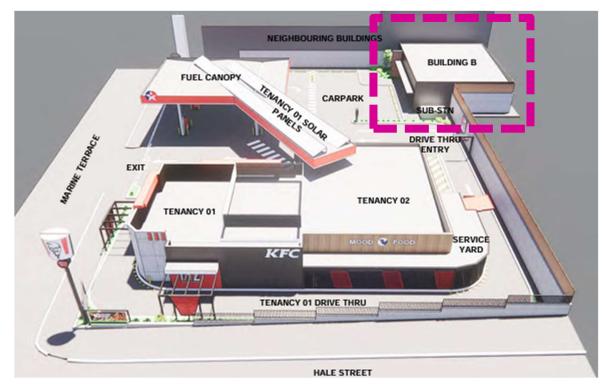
Building subject to the proposed planning application (Source: inaspace Architecture + Design)
